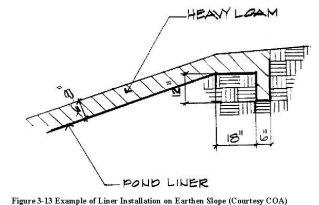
Example of Liner Installation on Earth Slope (Courtesy COA)
